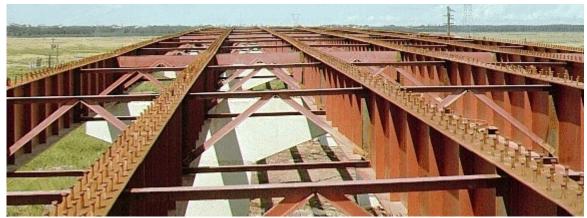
12. View of a steel girders in a bridge with shear studs
